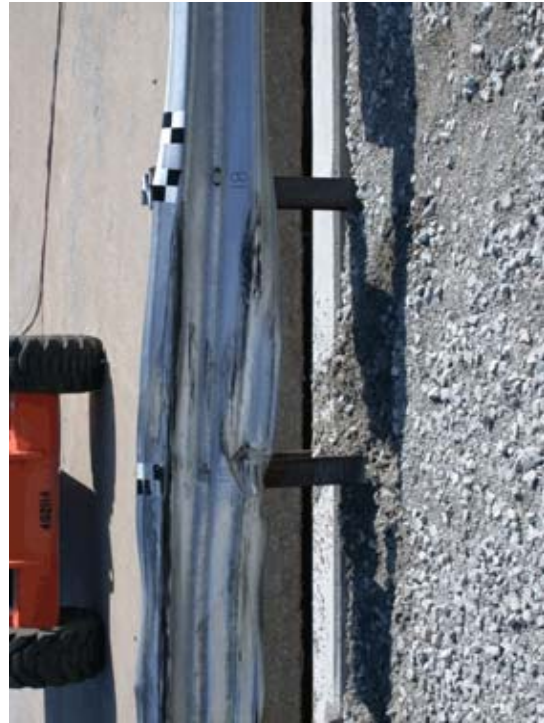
W-Beam Guardrail System Damage, Test KC-2
